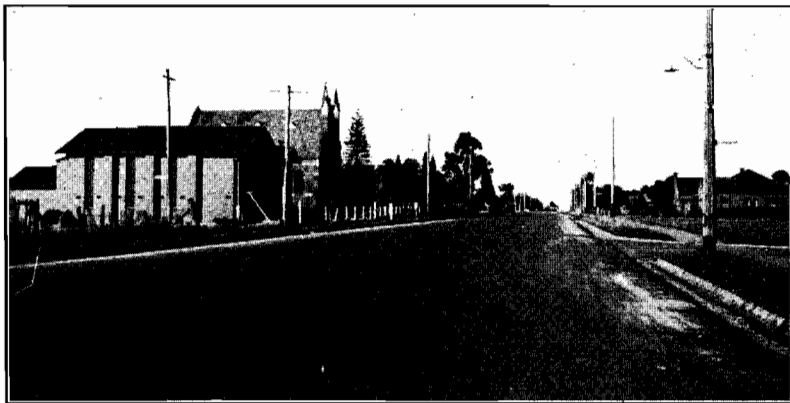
Reconstructed section of Warrigal Road in the City of Box Hill.
